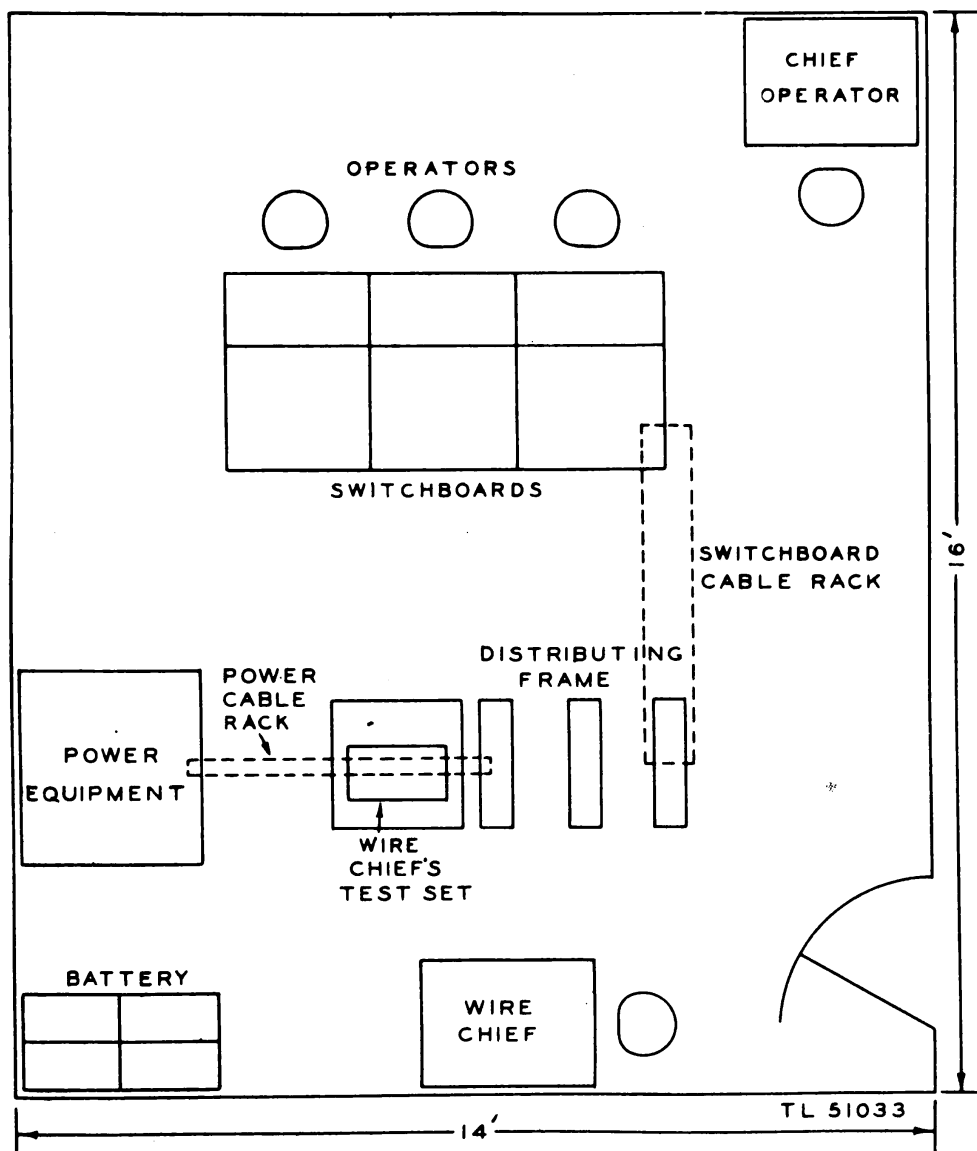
Suggested floor plan for Telephone Central Office Set TC-10 in one room.
